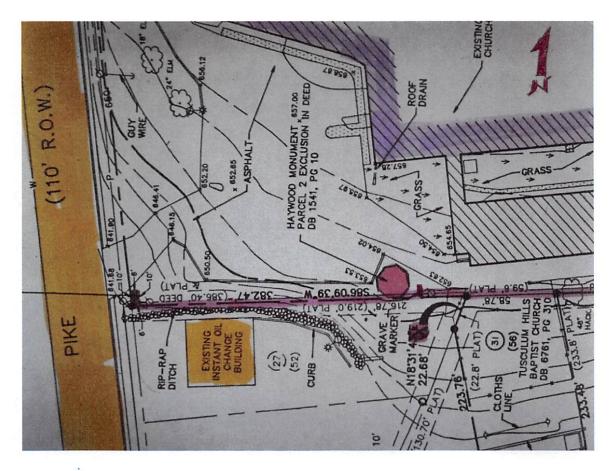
Construction plans showing monument, grave marker and actual unmarked grave site.
